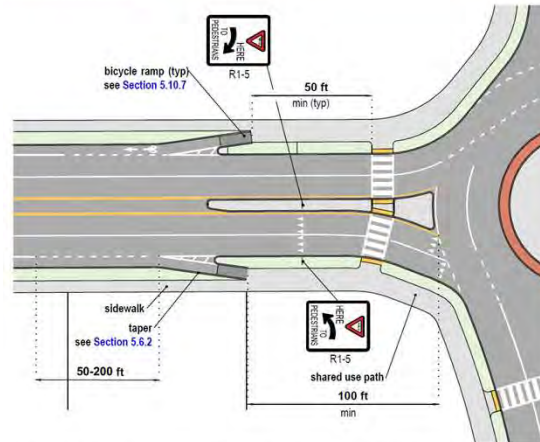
Typical Layout of Bike Lane Transitions to Shared Use Path at Multilane Roundabout with Bike Ramps
